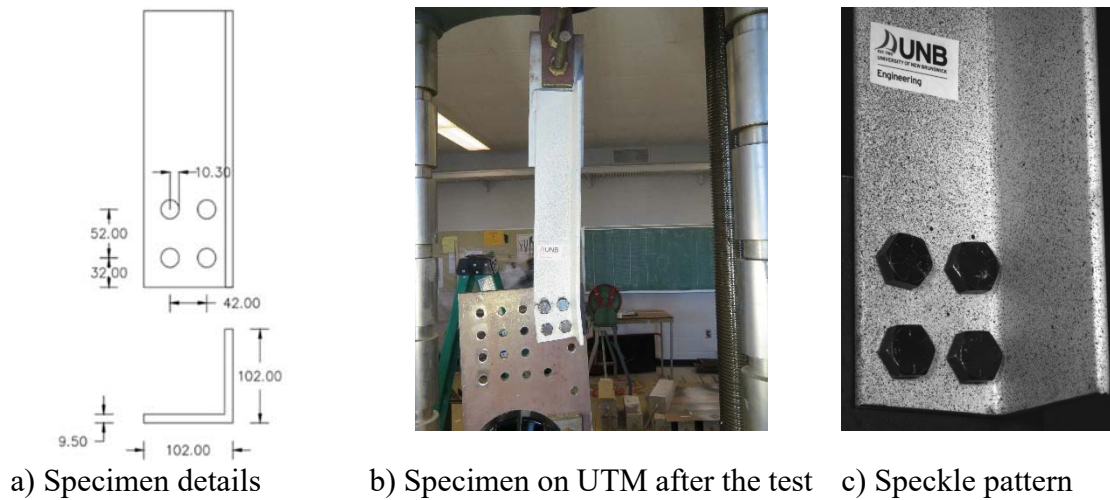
Details of bolted L102x102x9.5 connection prior to testing
